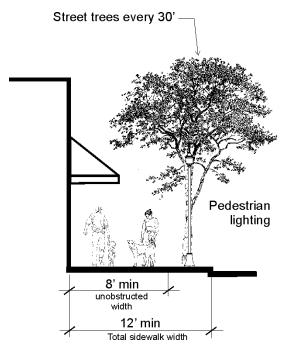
Minimum sidewalk requirements along pedestrian-oriented streets and where adjacent to facades of mixed-use and retail buildings greater than 100 feet in width.
